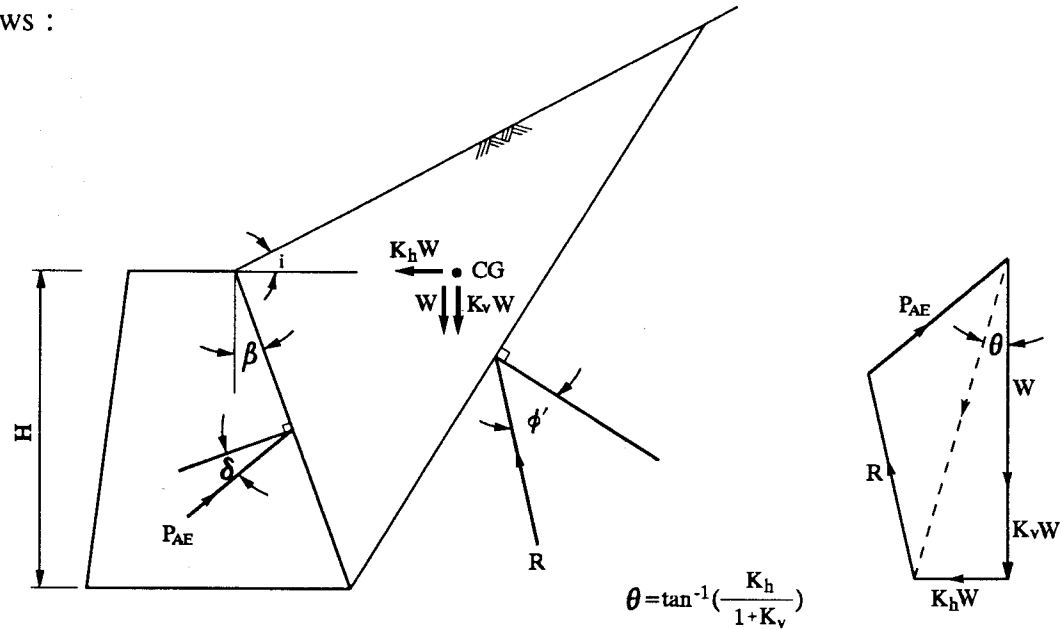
Typical Gravity Retaining Wall Subject to Earthquake Loading
